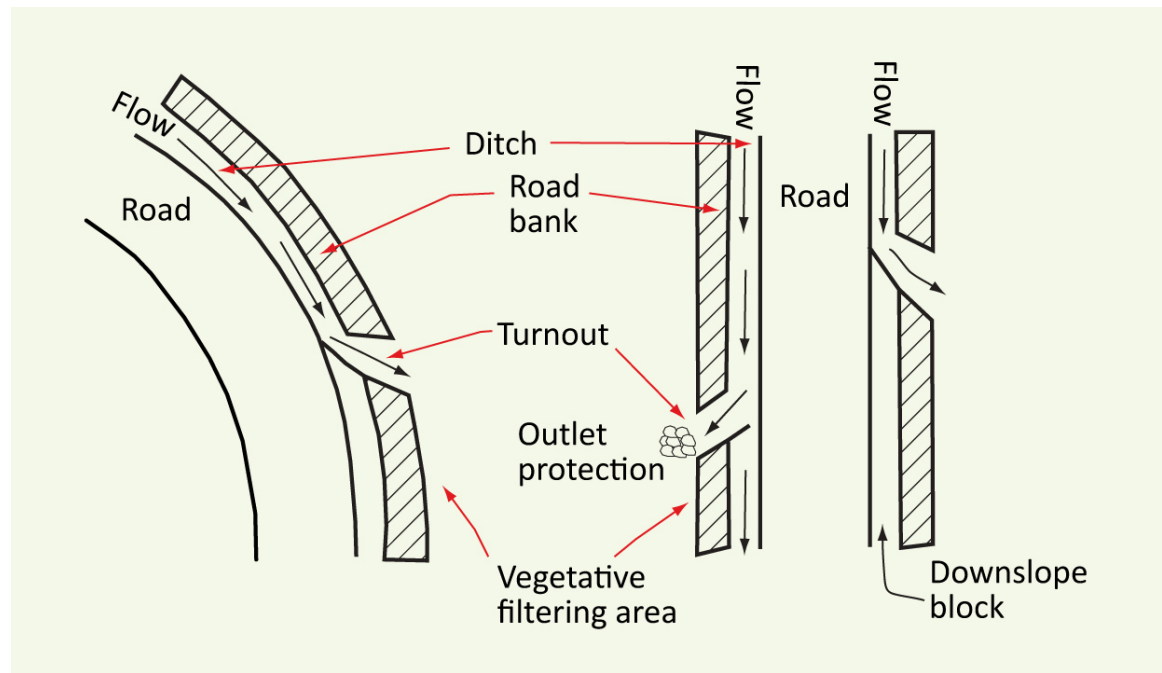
Typical locations for “turnouts” or lead-out ditches used to drain bermed or minor through cut road reaches. To be self-maintaining, lead out ditches must have a grade at least 2-3% steeper than the road surface or ditch that drains to them; otherwise they’ll plug with sediment deposits (U.S. EPA, 2000).
